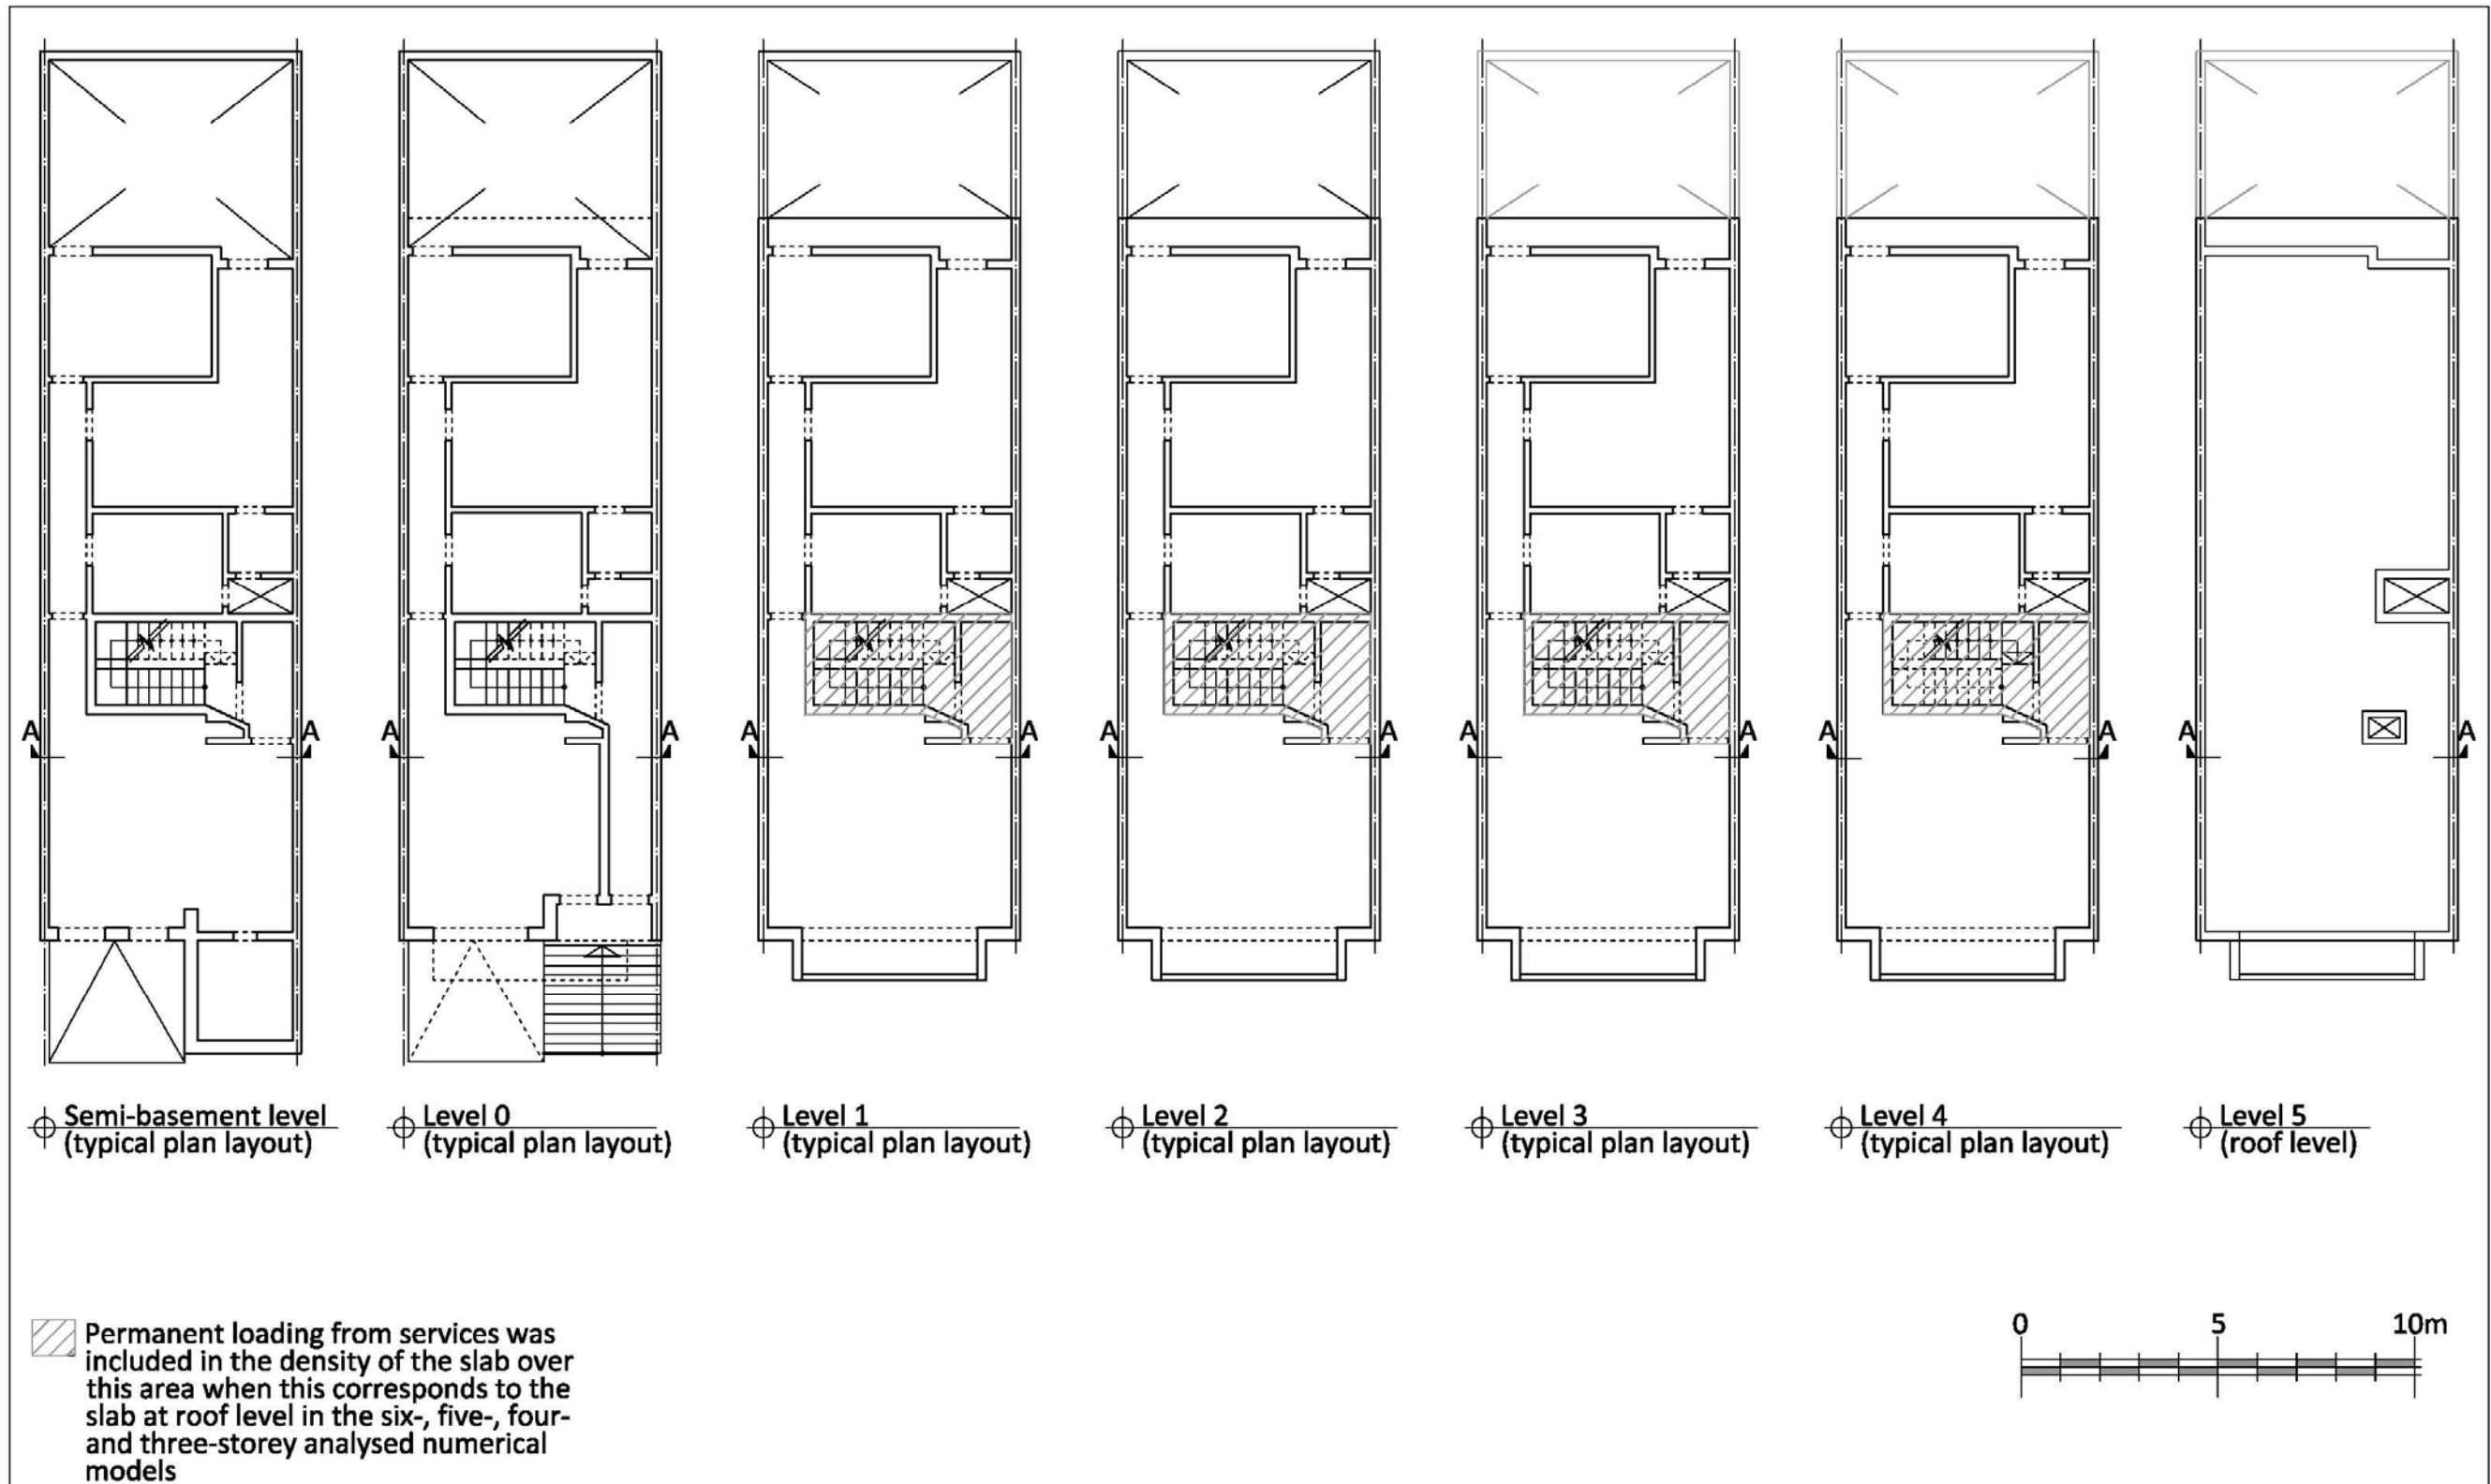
Plan layouts at all levels for analysed single building six-storey control numerical models (plan length-to-width ratio 2.75:1).
